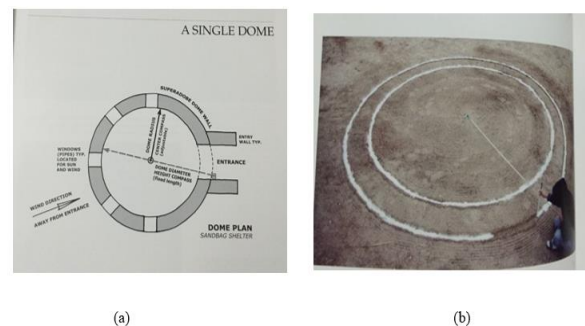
Step-1: (a) Dome plan (b) Dome Layout in construction phase
